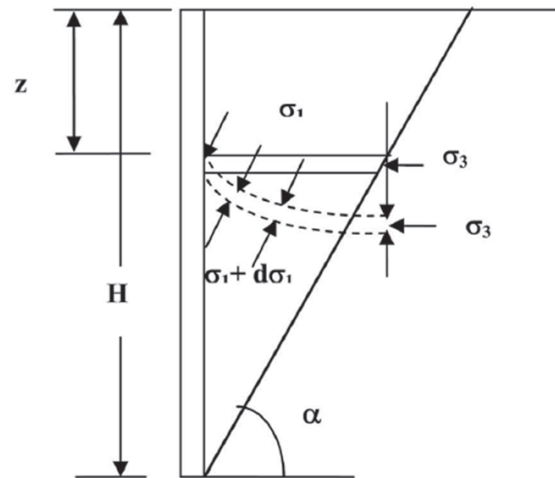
Trajectory of Minor Principal Stresses in Backfill Behind Retaining Wall (Paik and Salgado, 2003).
